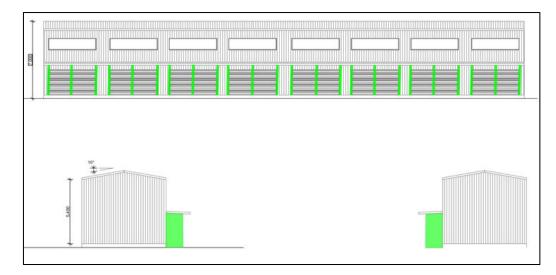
Indicative shooting bay acoustic walls (source: modified from Shed Ex, 2024)
